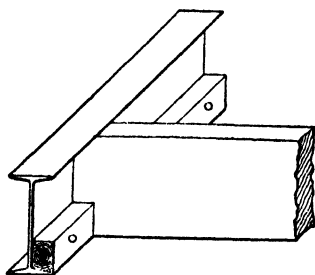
Wooden Beam Framed to I Beam with Wooden Cleat
